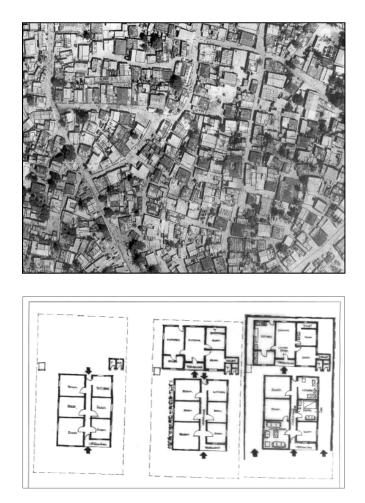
Top: aerial photo of Hana Nasif with a Floor Area Ratio² of 0.2-0.7. Down: an urban Swahili type house gradually modified from 1975 to 1992 by additions of rooms and fences to the detriment of air circulation and usability of outdoor space (Nguluma, 2003).
